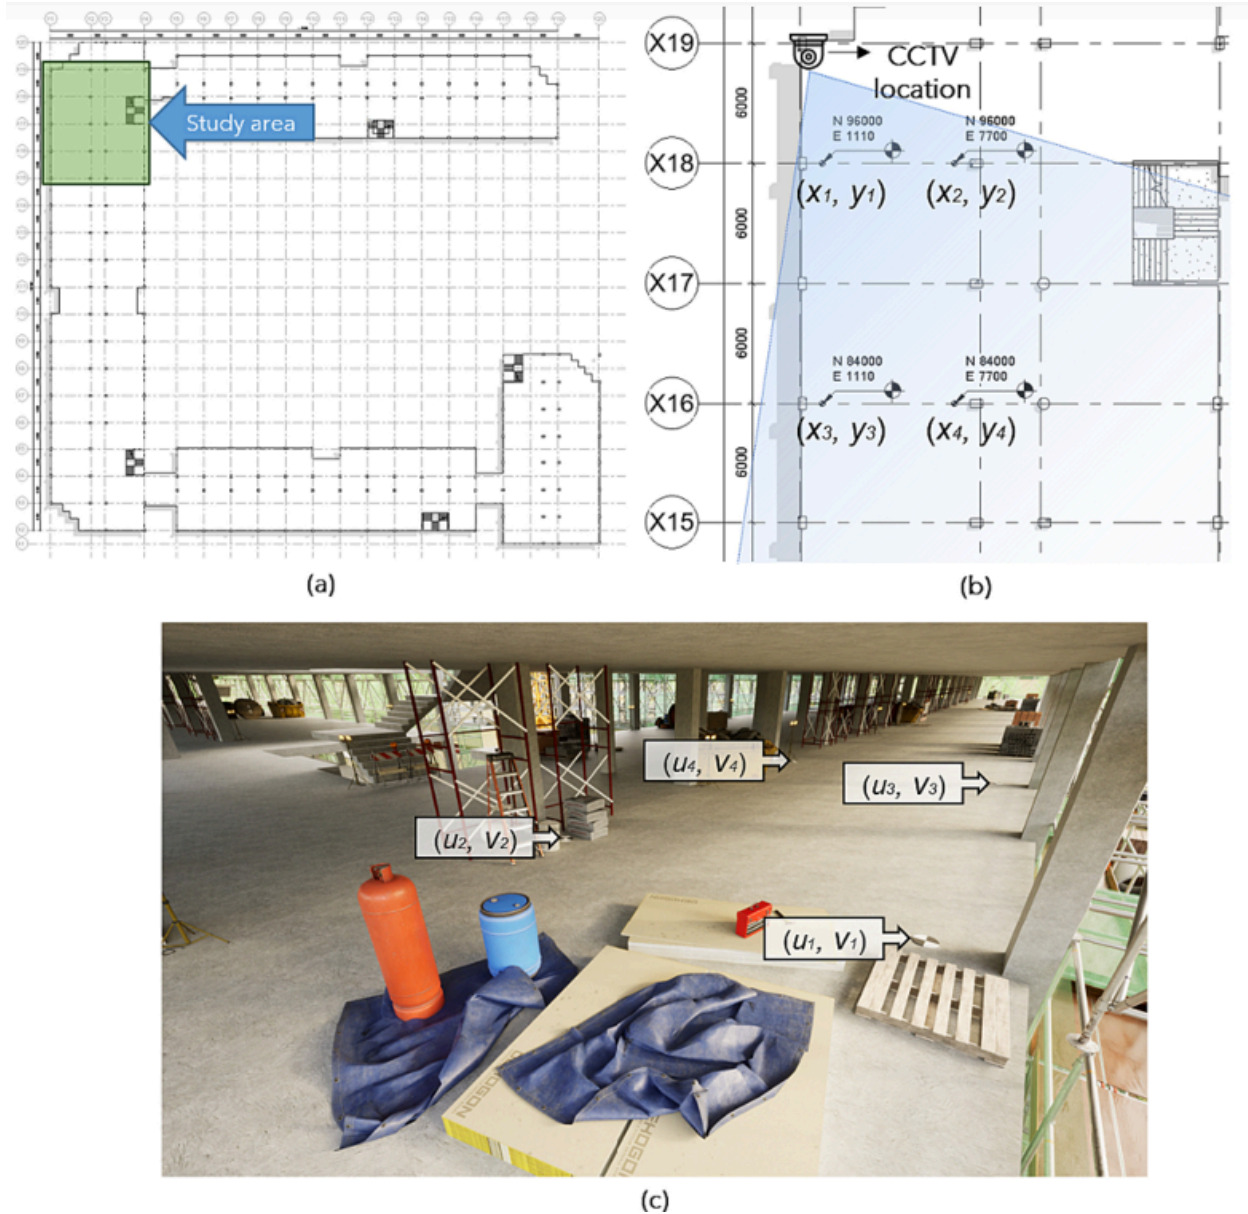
The assessment of four points from different perspectives: (a) Floor plan designed in BIM (b) The area of studied building (c) Visualization of construction area
